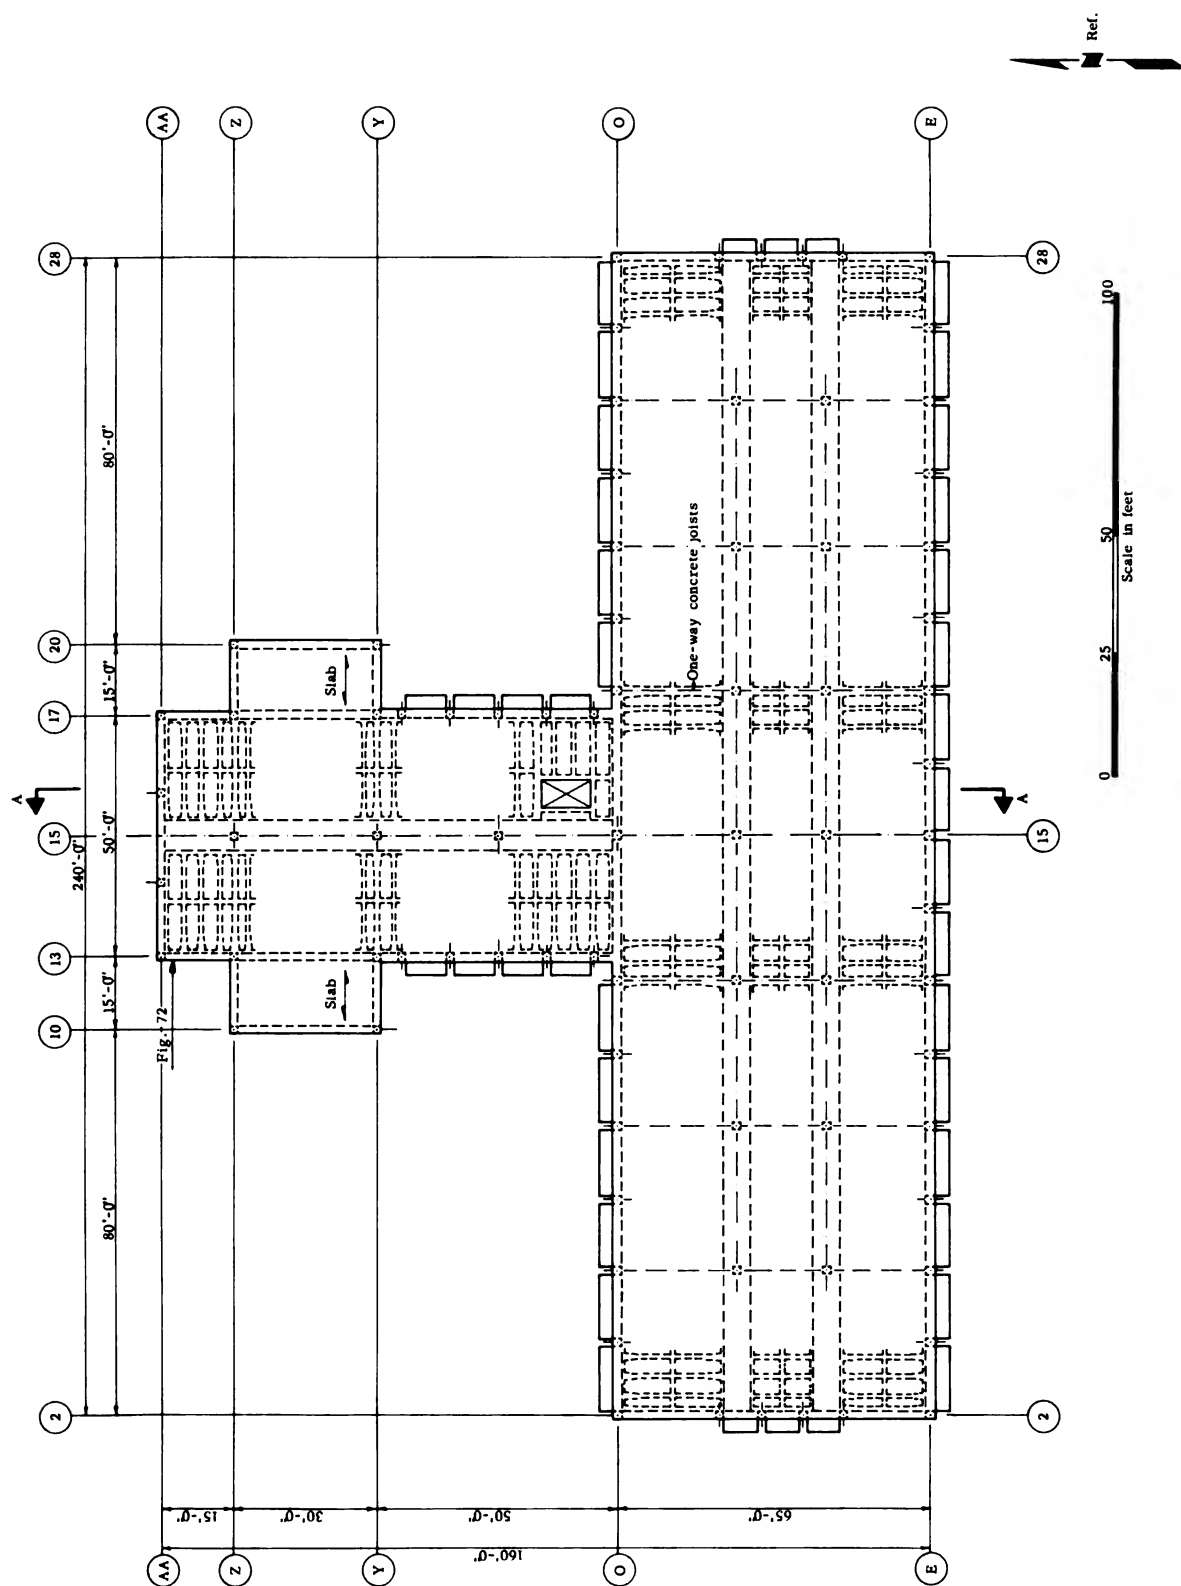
Olive View Hospital, psychiatric unit. Roof framing plan.
